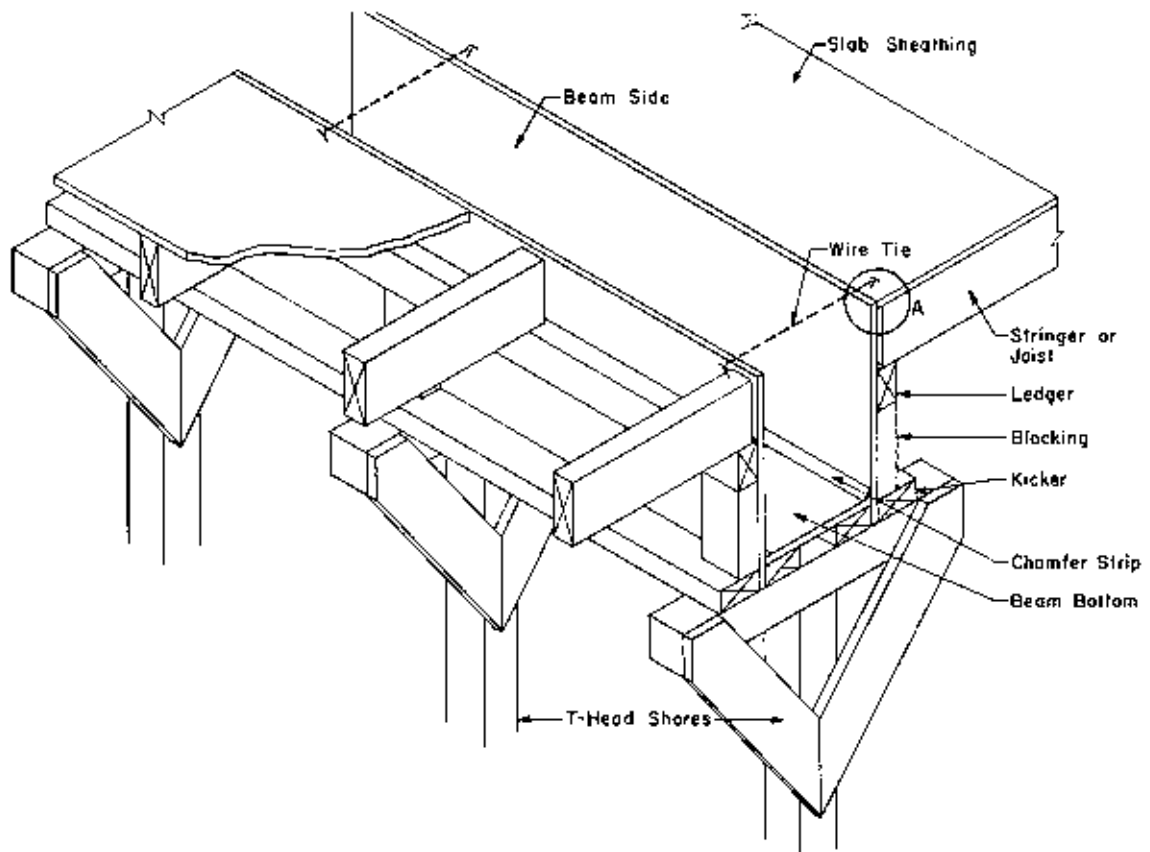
Beam and slab form. (Courtesy of American Concrete Institute)
